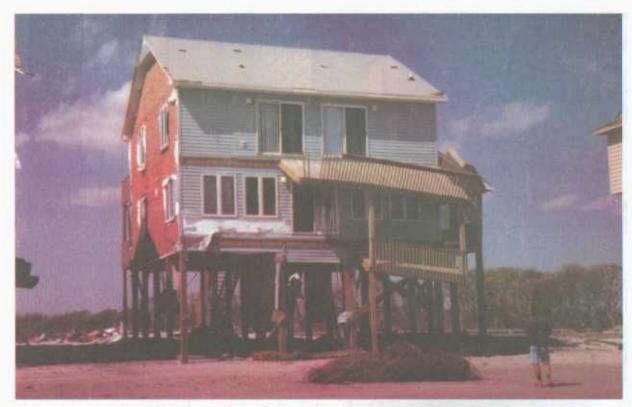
The BPAT observed several hundred decks and porches that collapsed as a result of insufficient foundation support.
